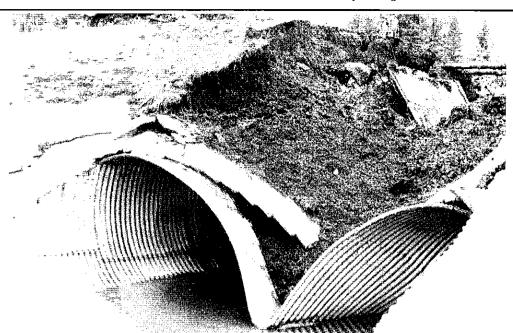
Big Mountain Creek culvert - After failure.
